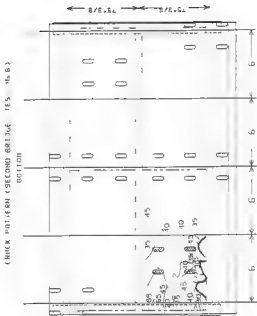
Bottom Cracking Pattern (Second Bridge - Test No 6)
